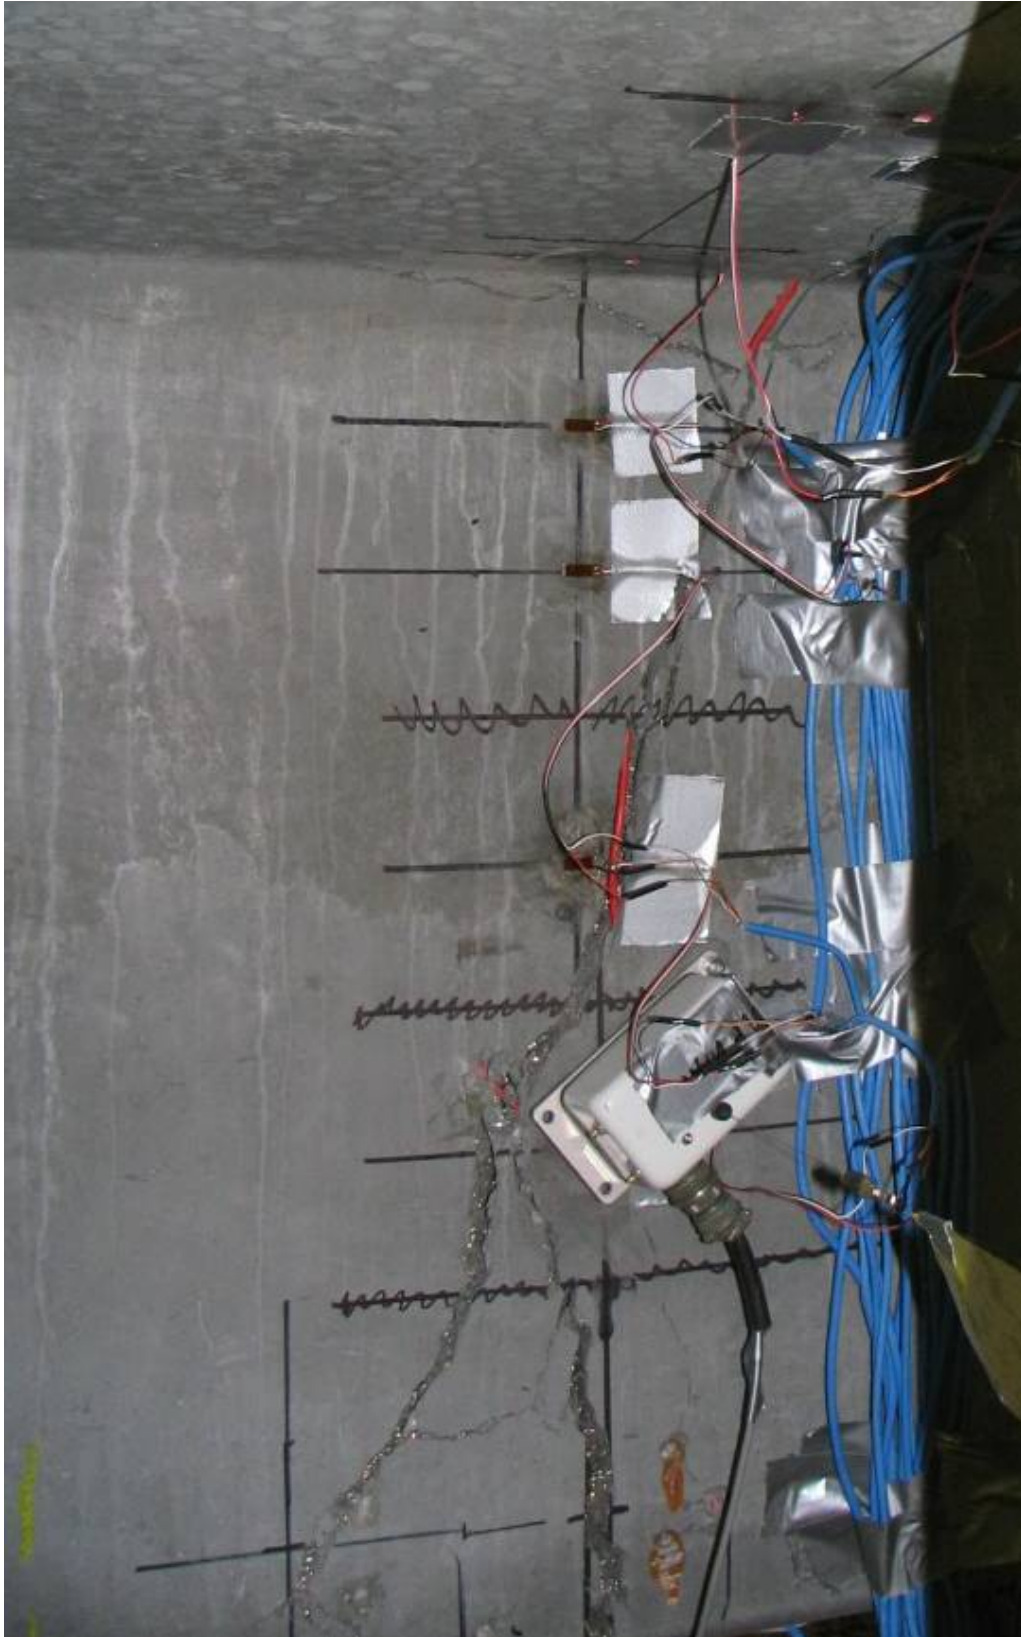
Photo. North face of Girder P2-70F south web immediately after failure.
